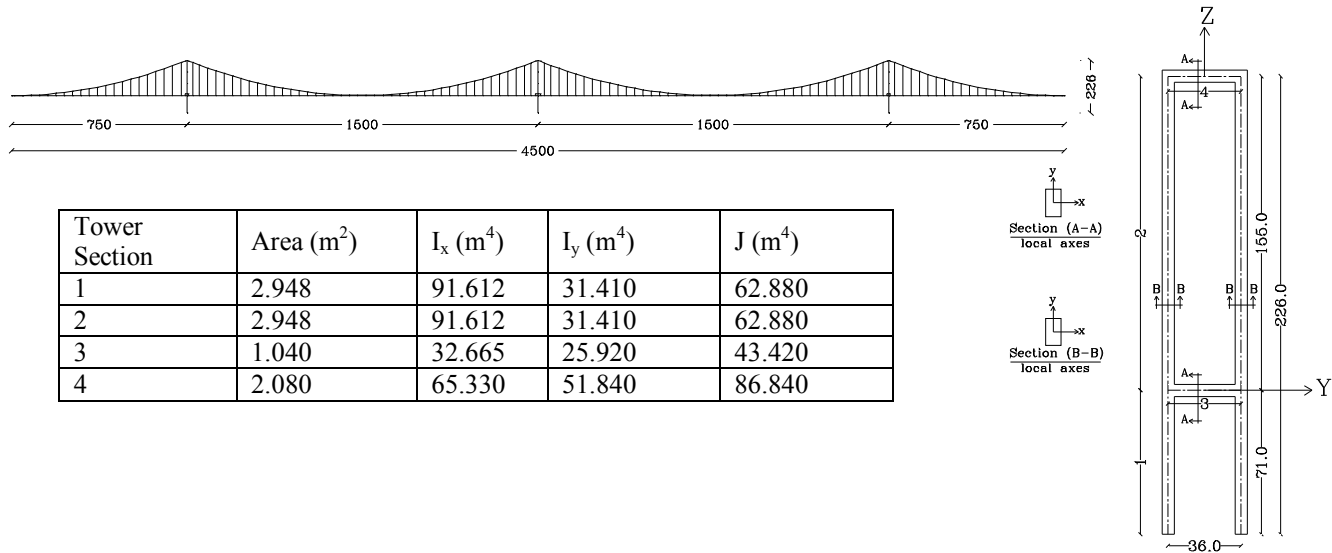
Four Spans Suspension Bridge Layout – Two Central Spans 1500m Each
